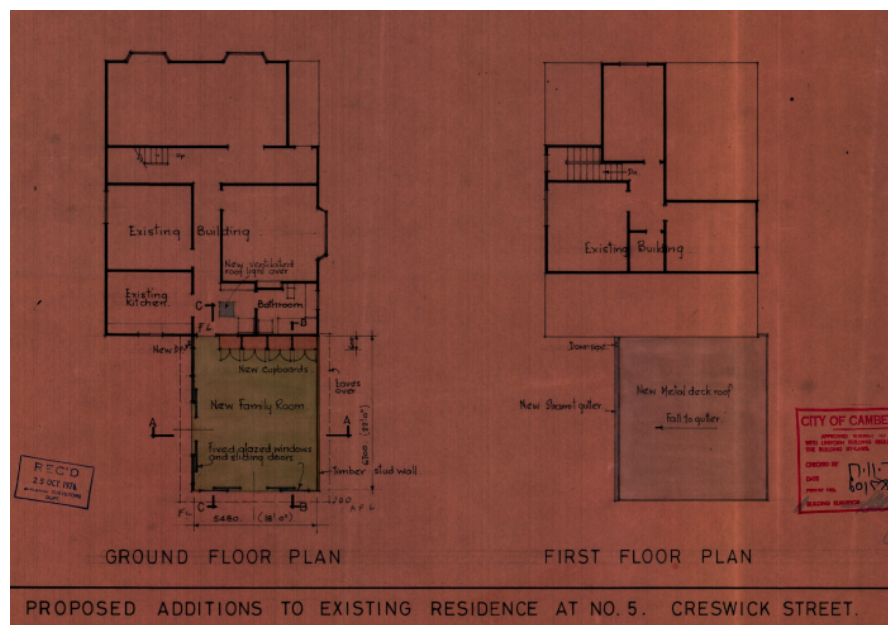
Drawing by A. F. Colafella Pty Ltd Consulting Engineers, depicting the proposed extension to 5 Creswick Street, Deepdene. The City of Camberwell approved the drawings in 1976 and issued Building Permit No. 60158. (Source: Boroondara City Council)
